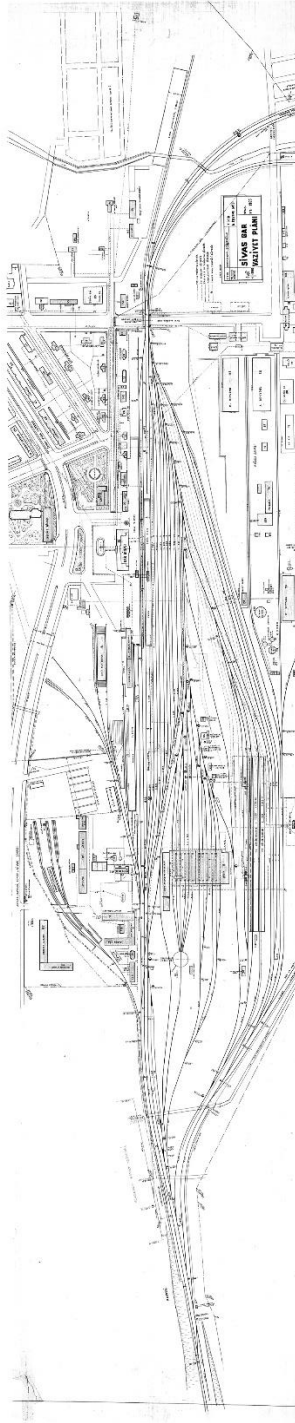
Site Plan of Sivas Railway Station Area in 1966
